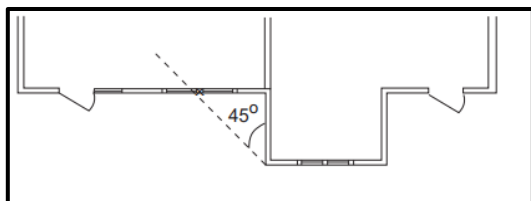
Stage 1 Plan - 45° guideline assessment. Centre of affected window is within 45° angle on the plan so stage 2 needs to be utilised.
